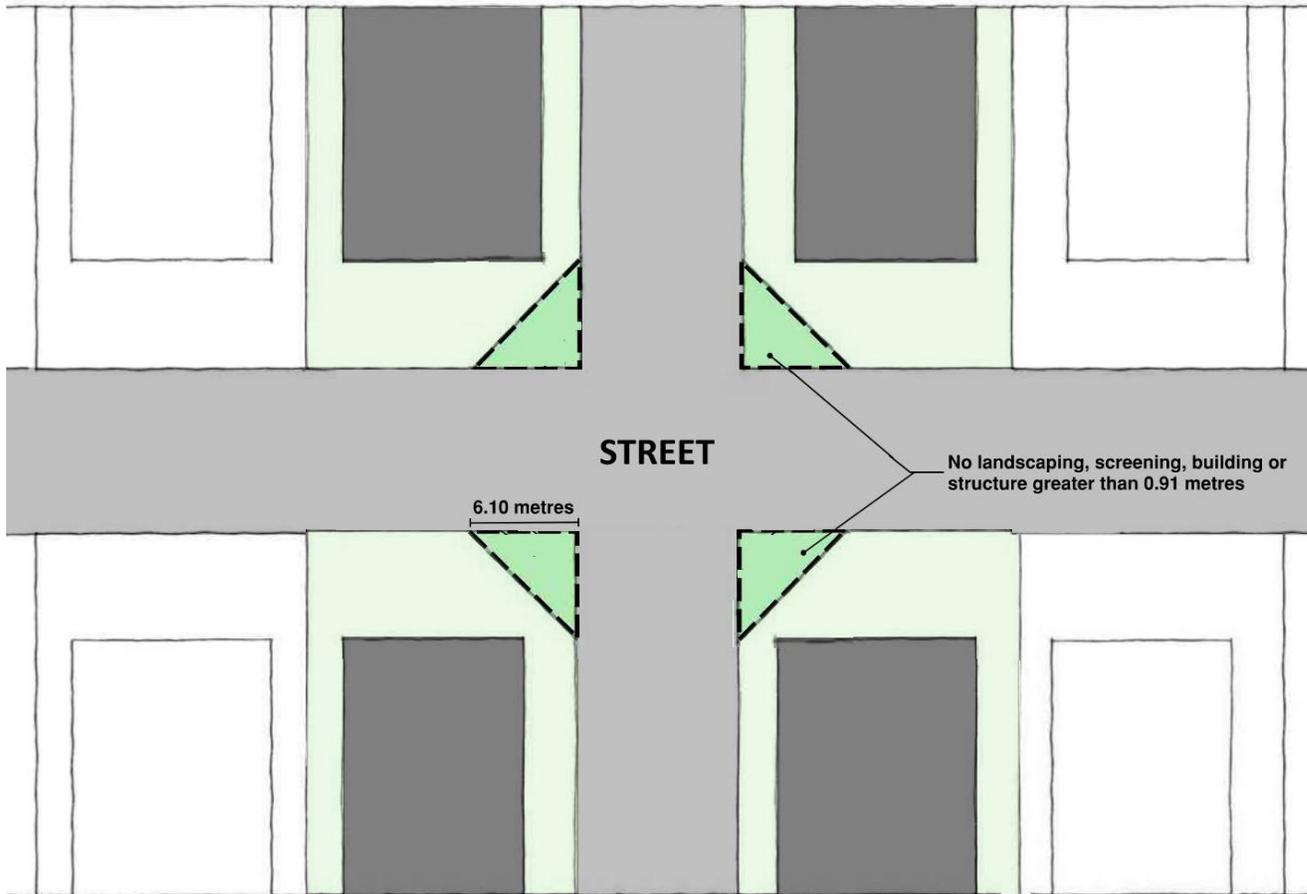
Visibility at Intersections, Area that landscaping, screening, building, or structures are prohibited over 0.91 metres in height
